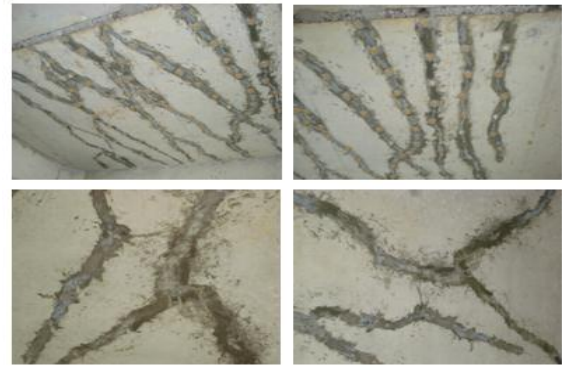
The crack that occurs at the bottom part of two ways half slab precast
